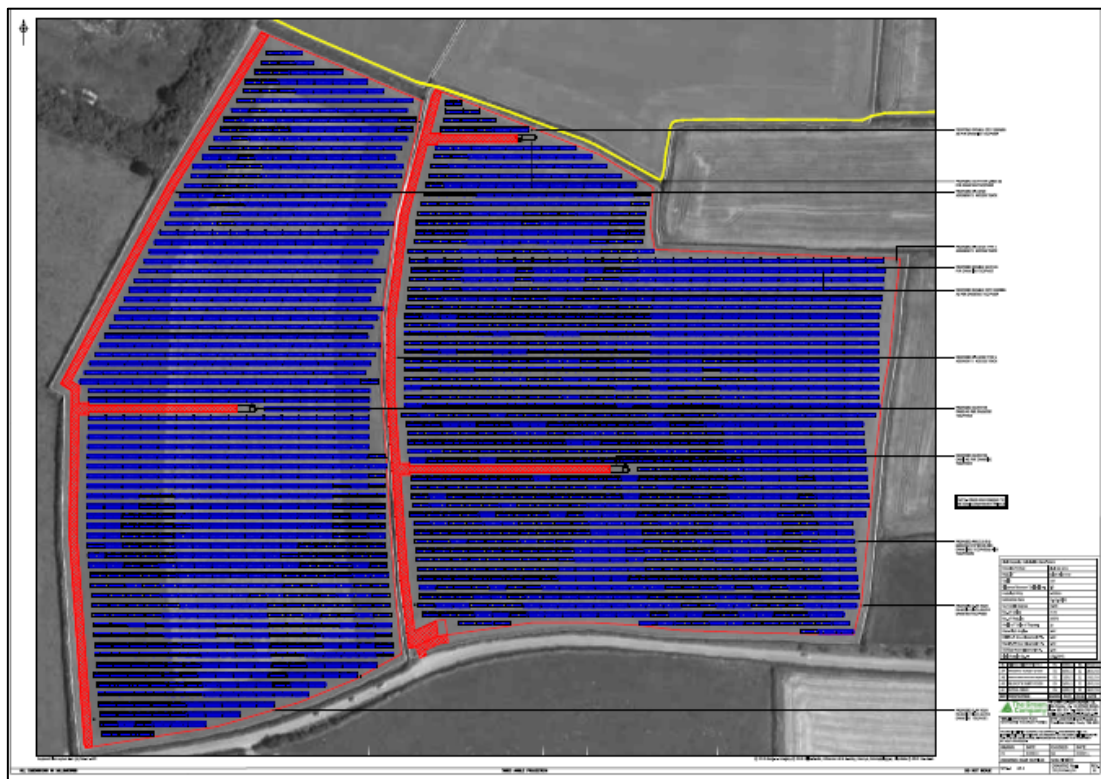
The preliminary layout of solar panels proposed for the Treveper site.
